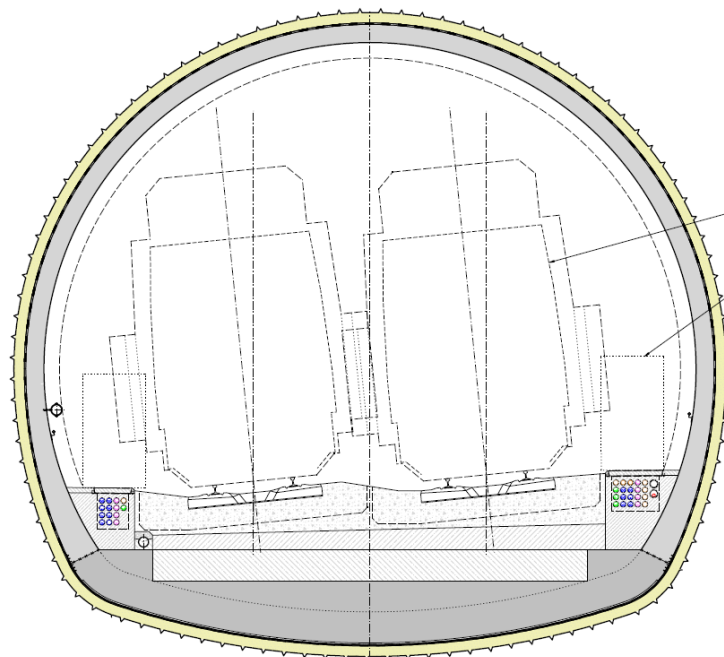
Cross-section of the excavated part of the Líbeznice Tunnel (Sagasta s.r.o.)
